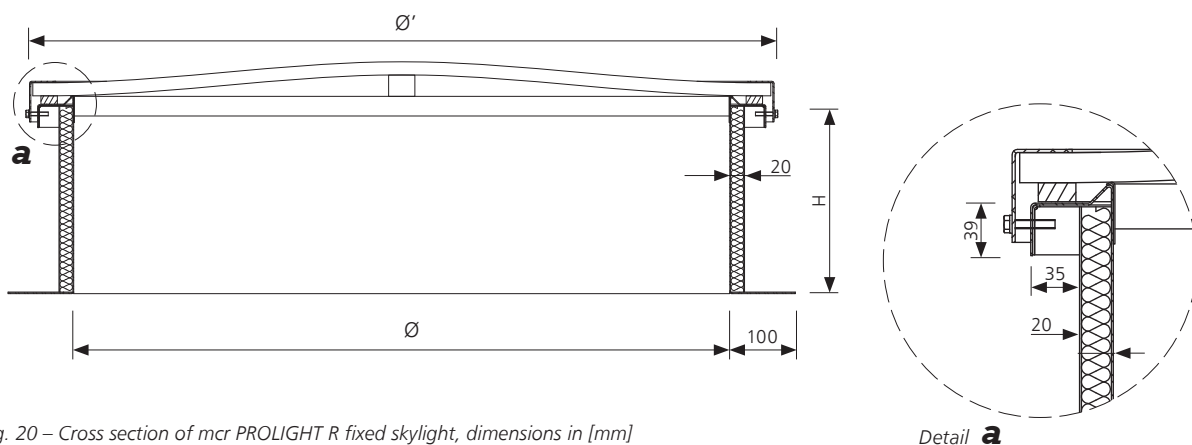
Cross section of mcr PROLIGHT R fixed skylight, dimensions in [mm]
